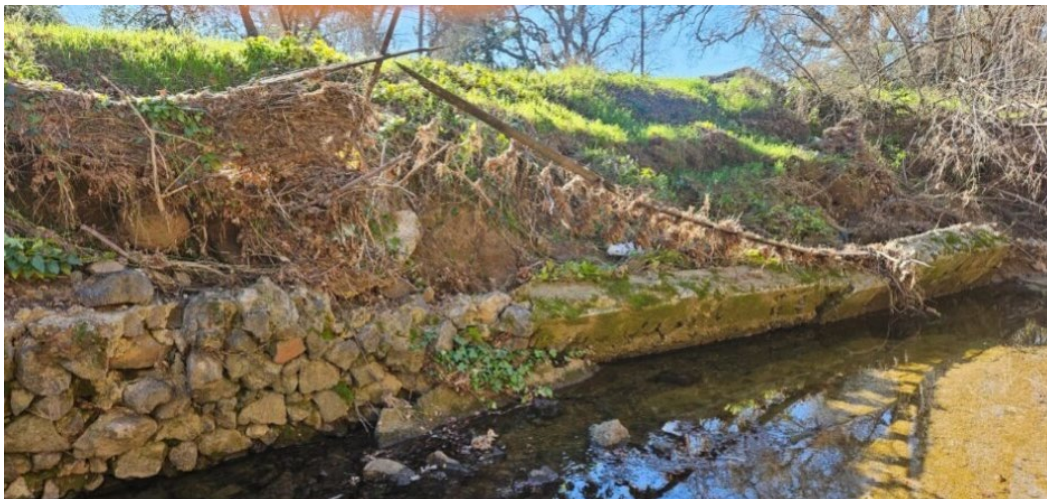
Failed Retaining Wall Near Burns Valley Creek.
